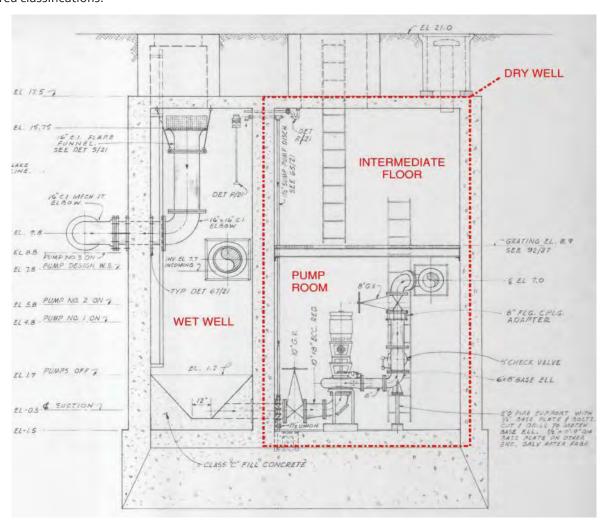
Typical Dry Well / Wet Well Pump Installation - Existing WWPS No. 18
